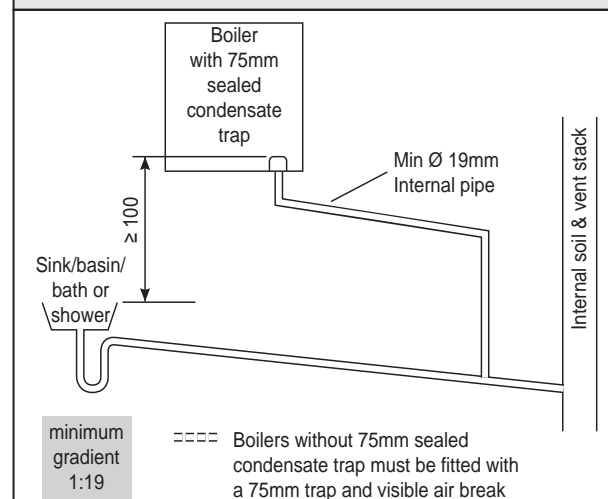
Connection of a Condensate Drainage Pipe Downstream of a Sink, Basin, Bath or Shower Water Trap to Internal Soil Vent Stack
